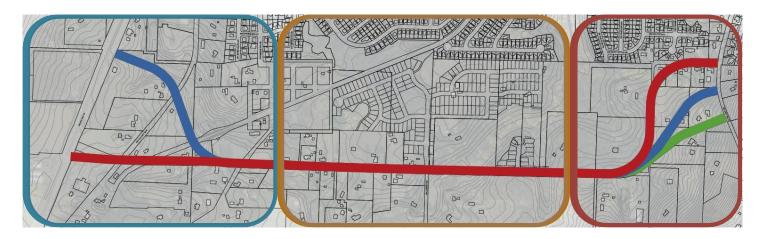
Brookman Concept Plan Subareas and Alignment Options Considered
